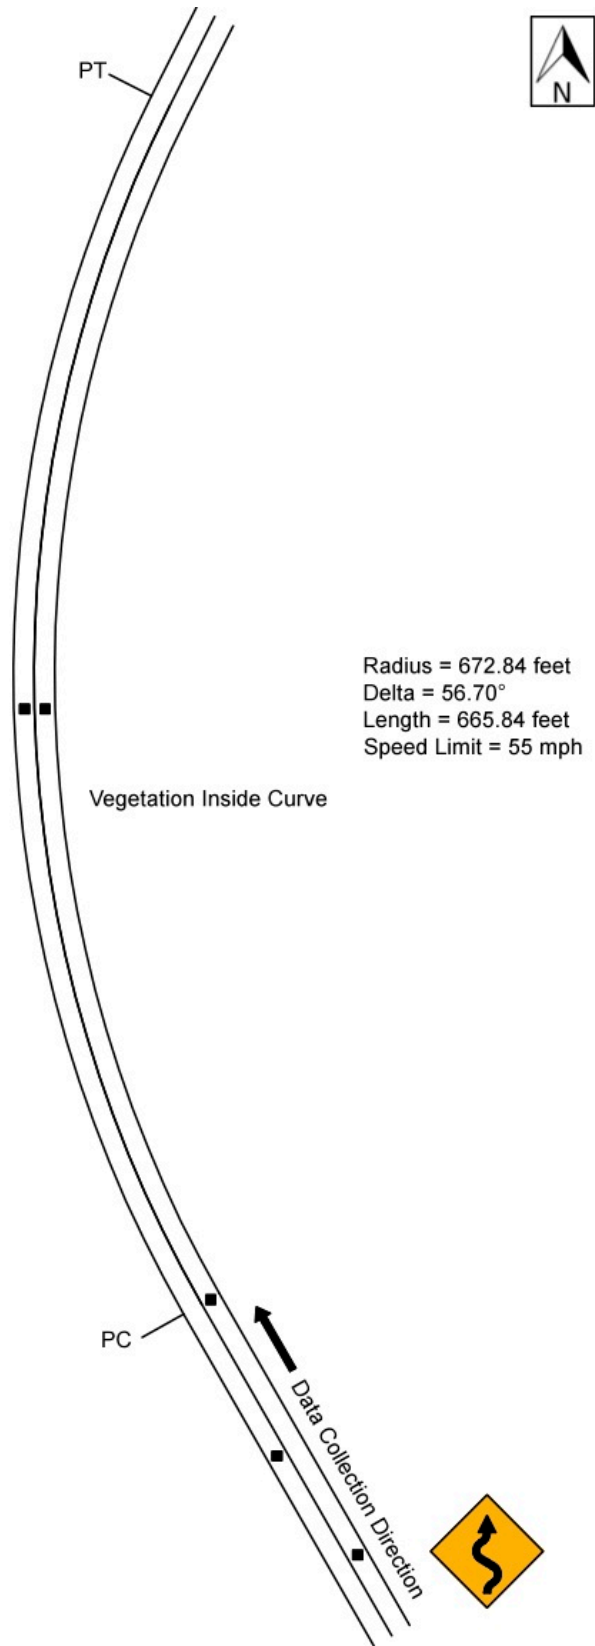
Diagram. Geometric layout of Alabama Location #1 (not to scale).
